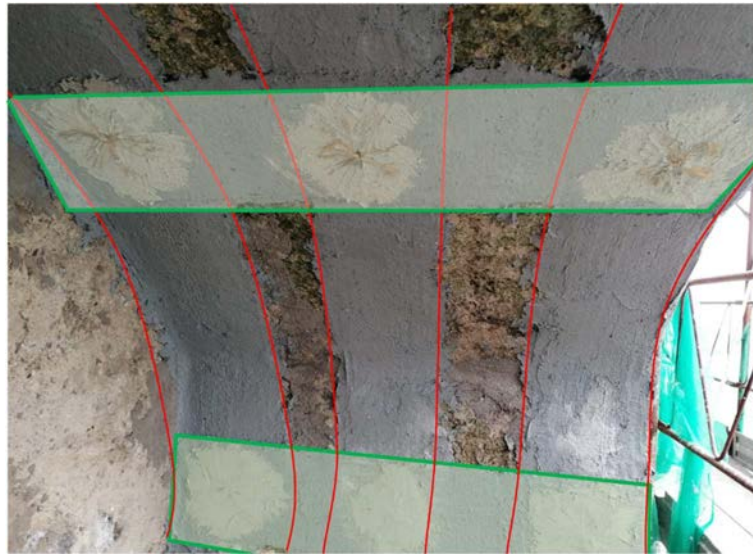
Intrados reinforcement. Red lines indicate longitudinal reinforcement bands, Green lines transversal ones. Joints element are at the intersection.
